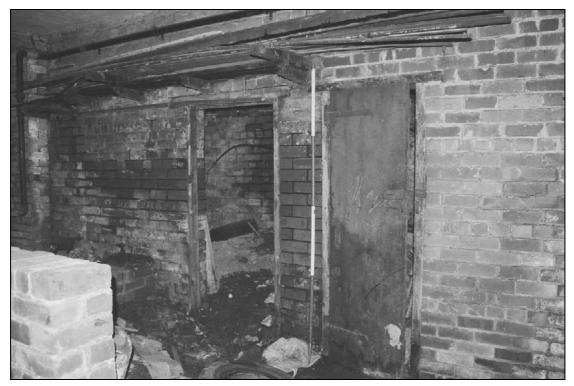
Detail of doors leading to B1 and B2, north wall of B3, west range (film 2.7)
